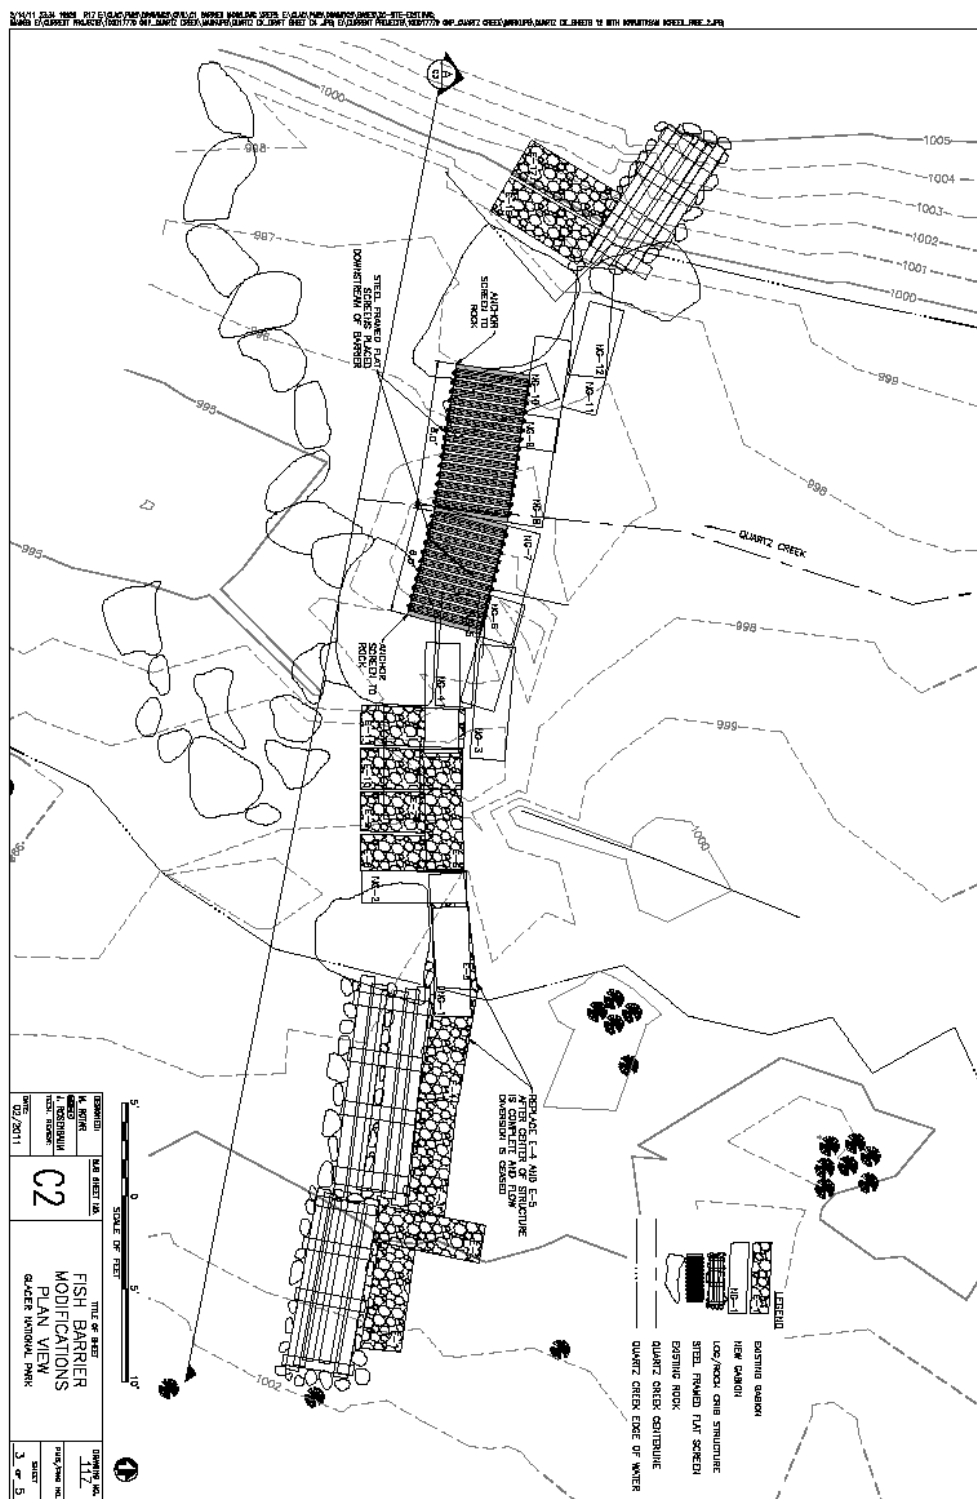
General design layout of modified fish barrier on Quartz Creek.
